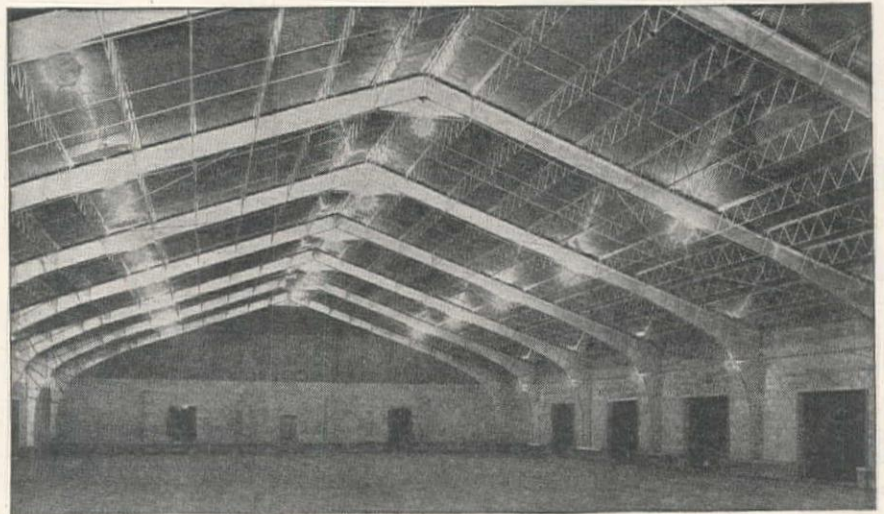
Inside view of building showing completed brickwork and roofing. Fabrication and erection by the Saxon Steel Co., Tulsa, Oklahoma.
